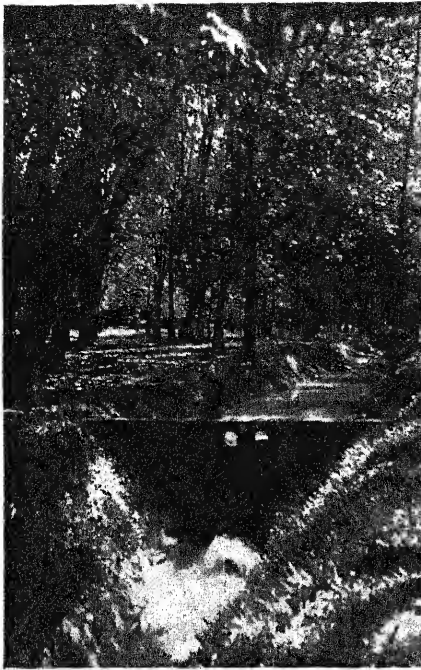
A concrete dam with de-Villiers type siphon, discharging water automatically to flush a drain
